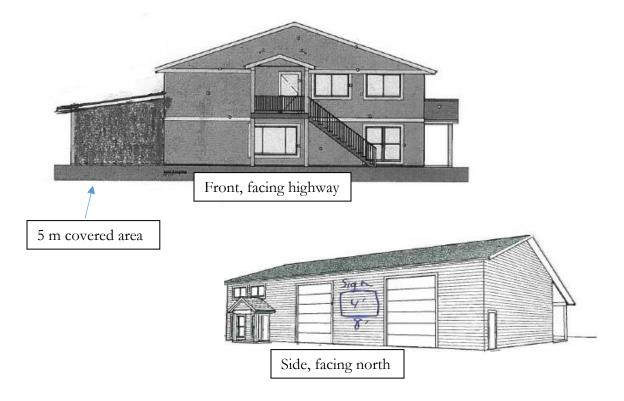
Elevation Drawings provided by Applicant of Proposed Building
